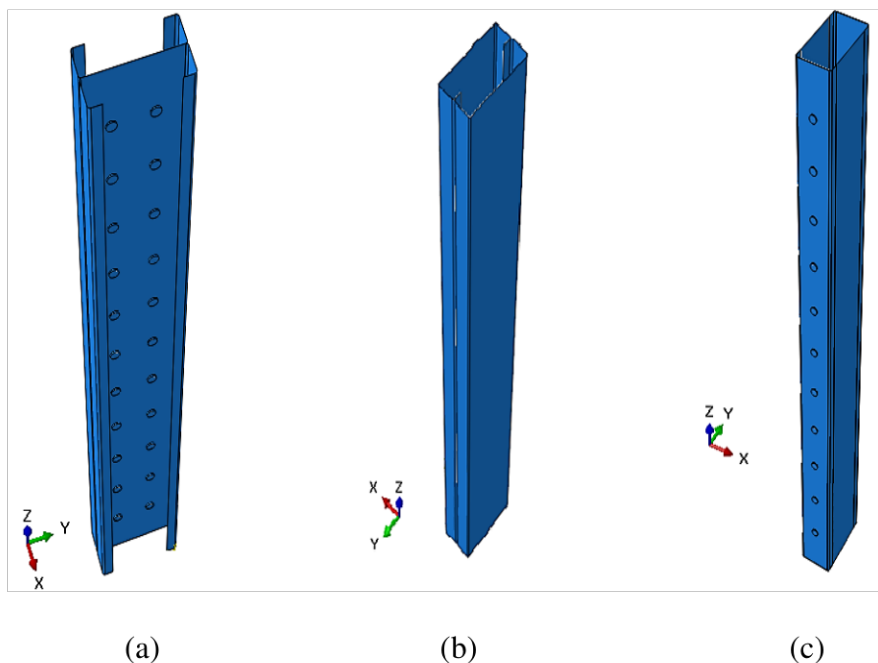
Numerical models of the empty C-columns: (a) Back-to-back; (b) Face-to-face; (c) Box.
